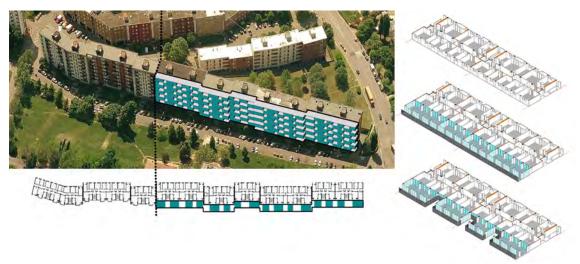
New configuration of building Pilastro Quartier in Bologna. New external parasite for to have a new margin. Right up existing above possible configuration of new margin.
